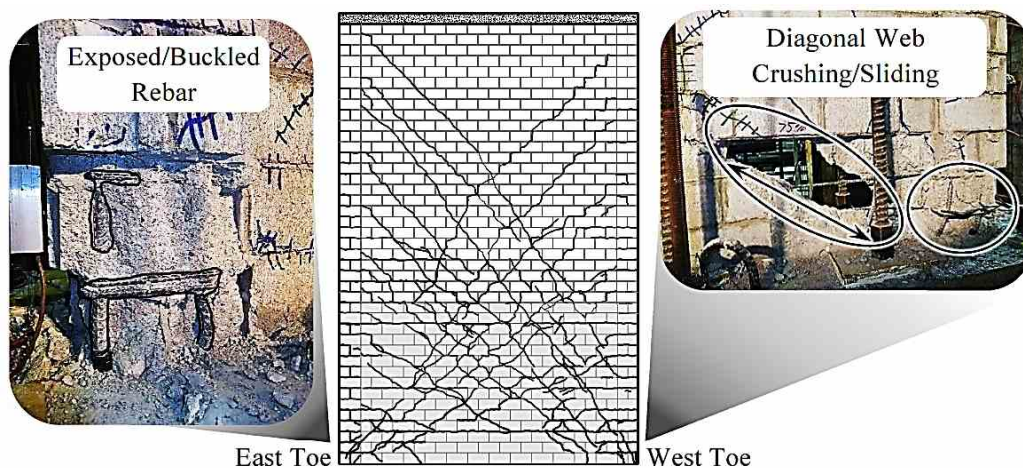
Crack Pattern and Failure Mechanisms in Wall 11
